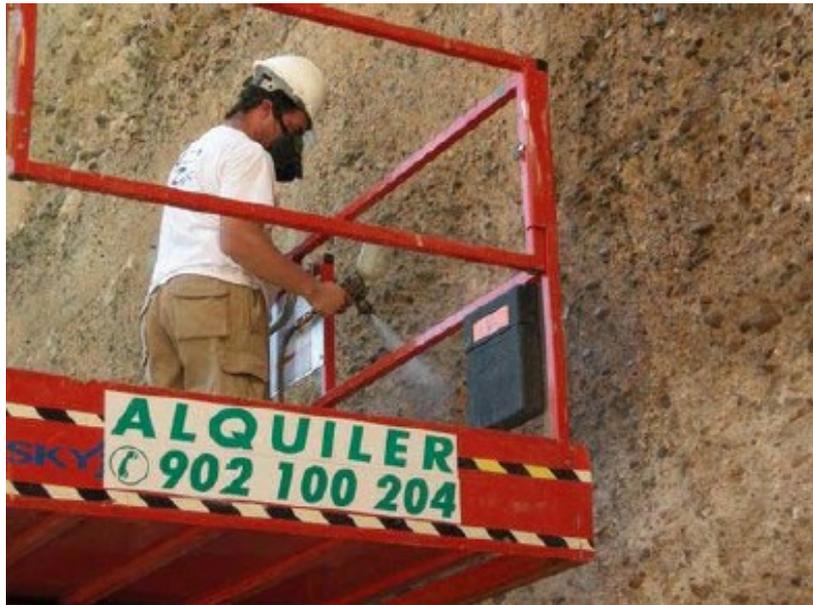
Seville (Spain), ethyl silicate injection through an aerosol gun on a rammed earth (*tapial*) wall
